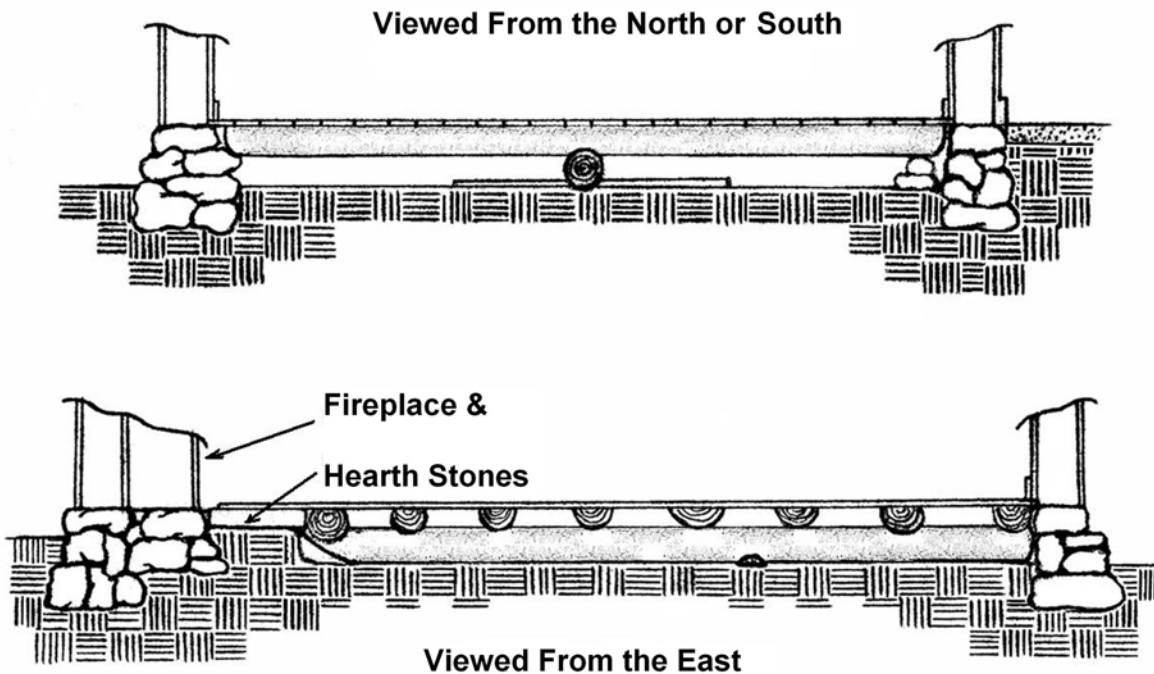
Detail drawings of the central support beam floor construction in room block #2. Viewed from the north or south above, and from the east below.
